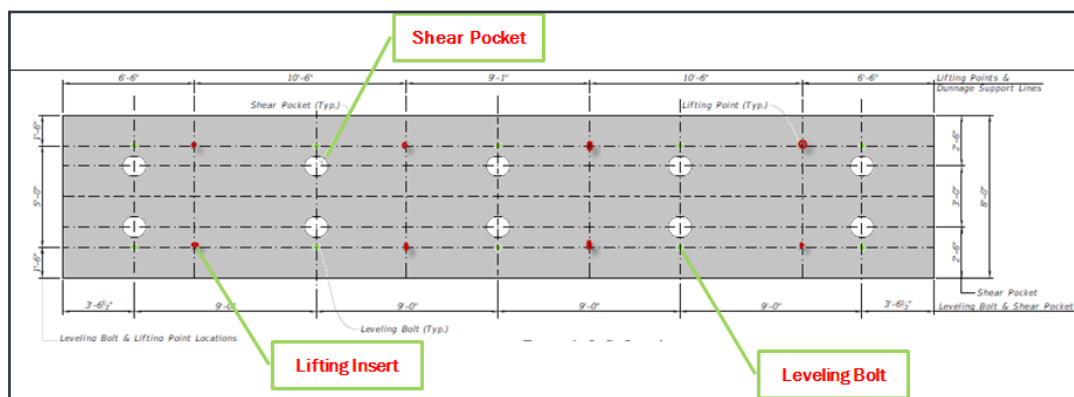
Full-depth precast deck panel with shear pockets for connection to girders
